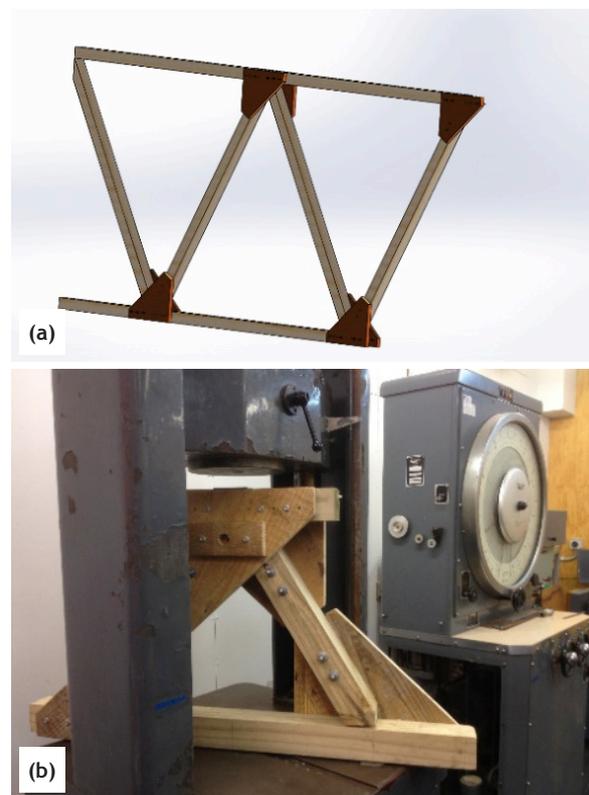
(a) Timber cheek plates (truncated triangles) on minor lateral trusses. (b) Test assembly showing crack-suppressing cleat parallel to and below chord.
